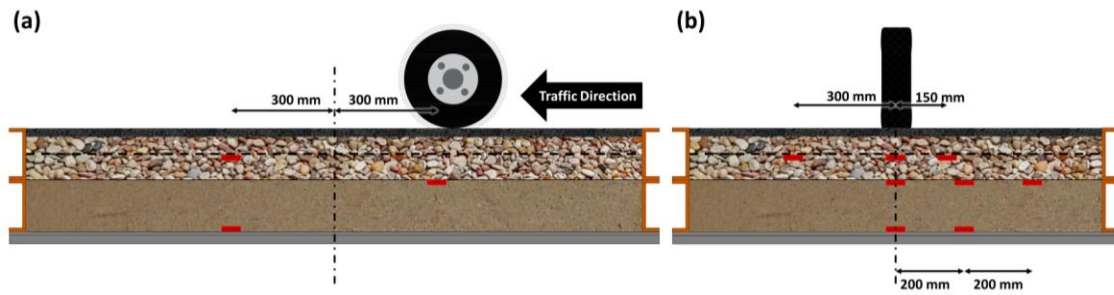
Pressure cell layout: (a) longitudinal cross-section; and (b) transverse cross-section.
